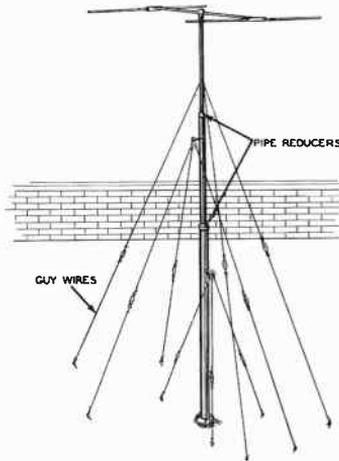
A 30 Foot Mast Constructed of Pipe.
